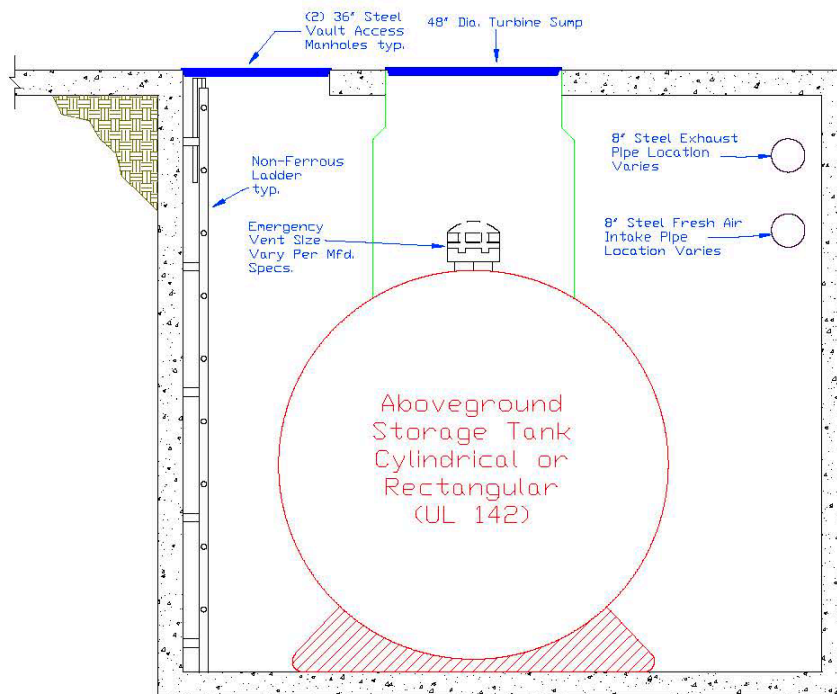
Sectional Views of Typical Vaulted AST (Ventilation
